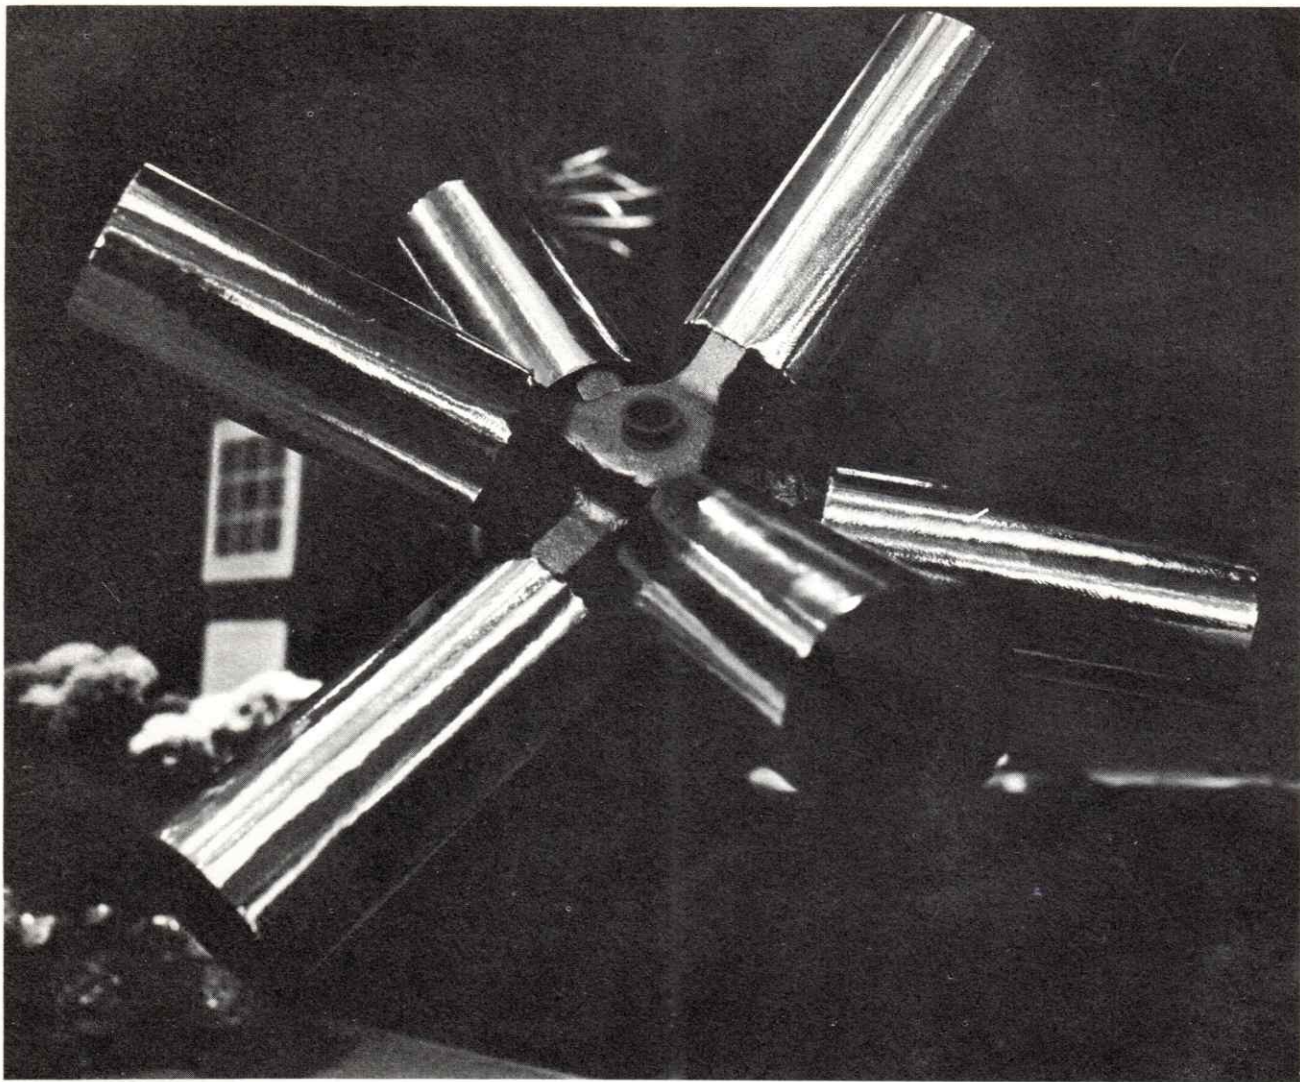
Exterior view of inner grid vertex hub. Slotted pipes (polished portions) are plugged into hub's cast steel tabs, a fillet weld permanently bonds joint. Each hub consists of a solid steel center with rectangular tabs for each member joined. Inner layer hubs have three tabs for inner grid members. There are two inner hubs for each exterior hub.
